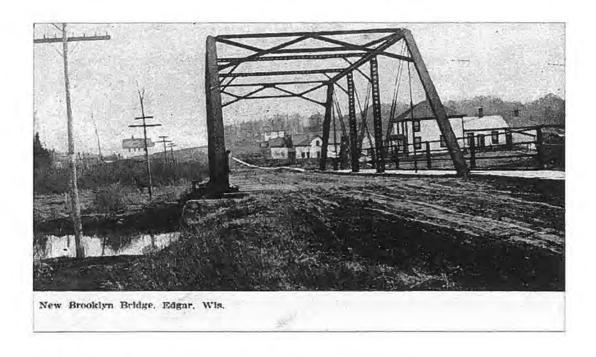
The New Brooklyn Bridge in Edgar, Wisconsin, is a typical example of a late nineteenth century truss bridge. (Source: Collection of Robert Newbery).
